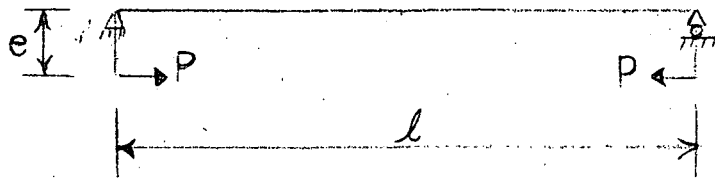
shows the test set-up for Prestressed Timber Beam Number Two-Tests A and B. Test A was performed without lateral support being provided and was terminated when the beam was about to buckle. Test B was started after lateral support was provided near the centerline and was terminated when difficulty was encountered with the prestressing device.
